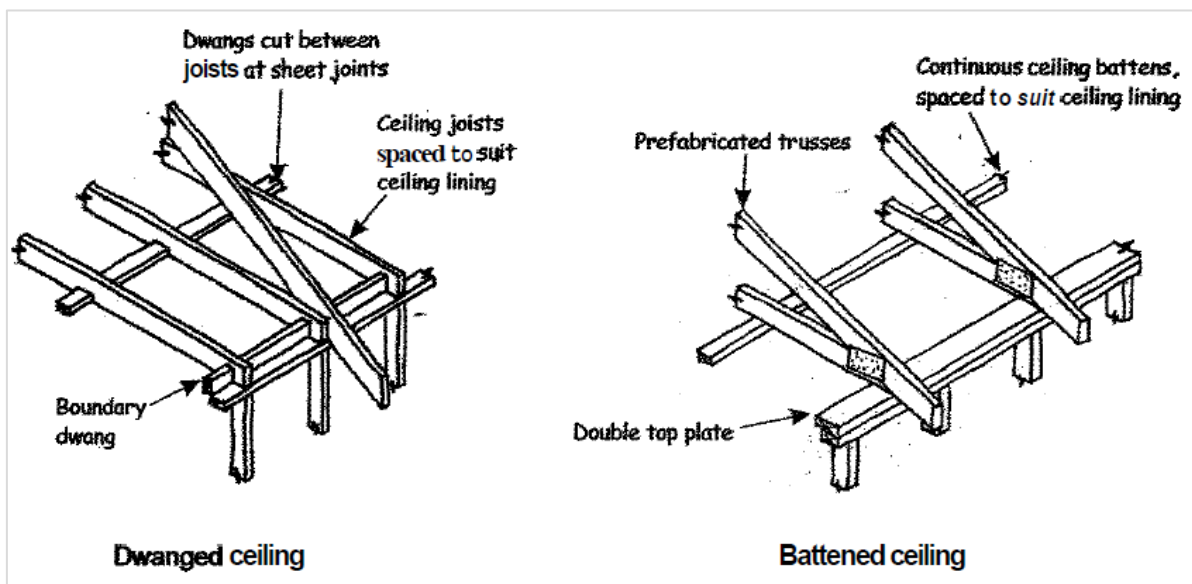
Construction of dwanged and battened ceilings (Shelton, 2004).
